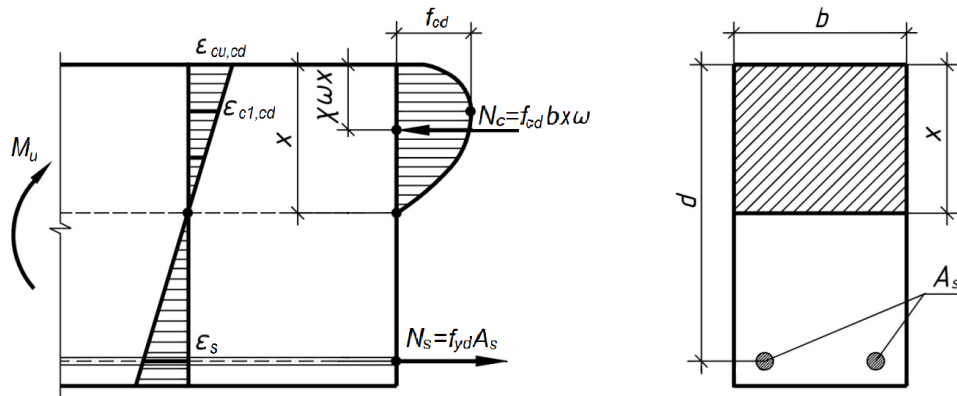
The design scheme of the reinforced concrete element in the normal section: distribution of forces, stresses and strains
